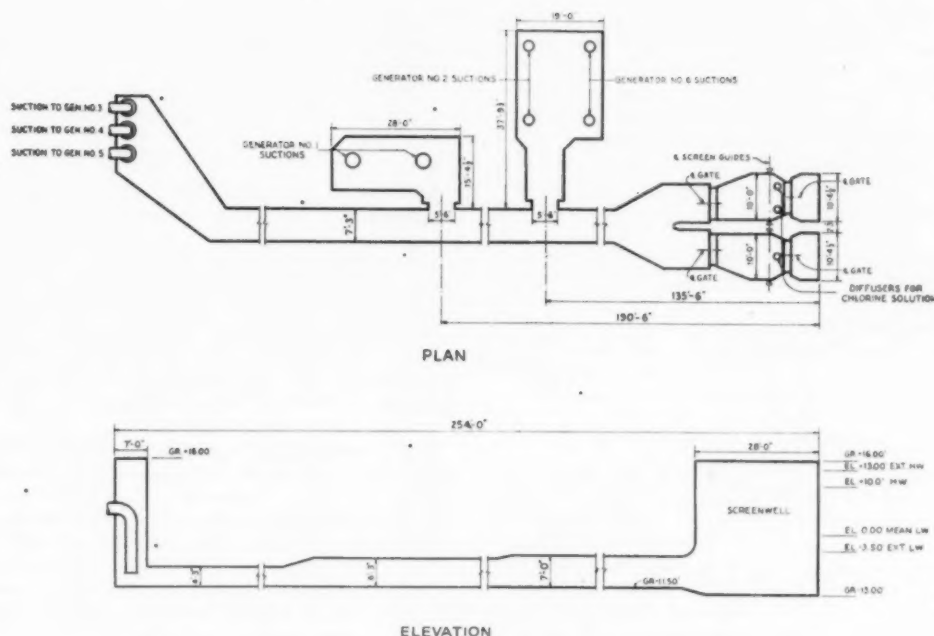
ARRANGEMENT OF INTAKE TUNNEL, ELECTRIC GENERATING STATION
